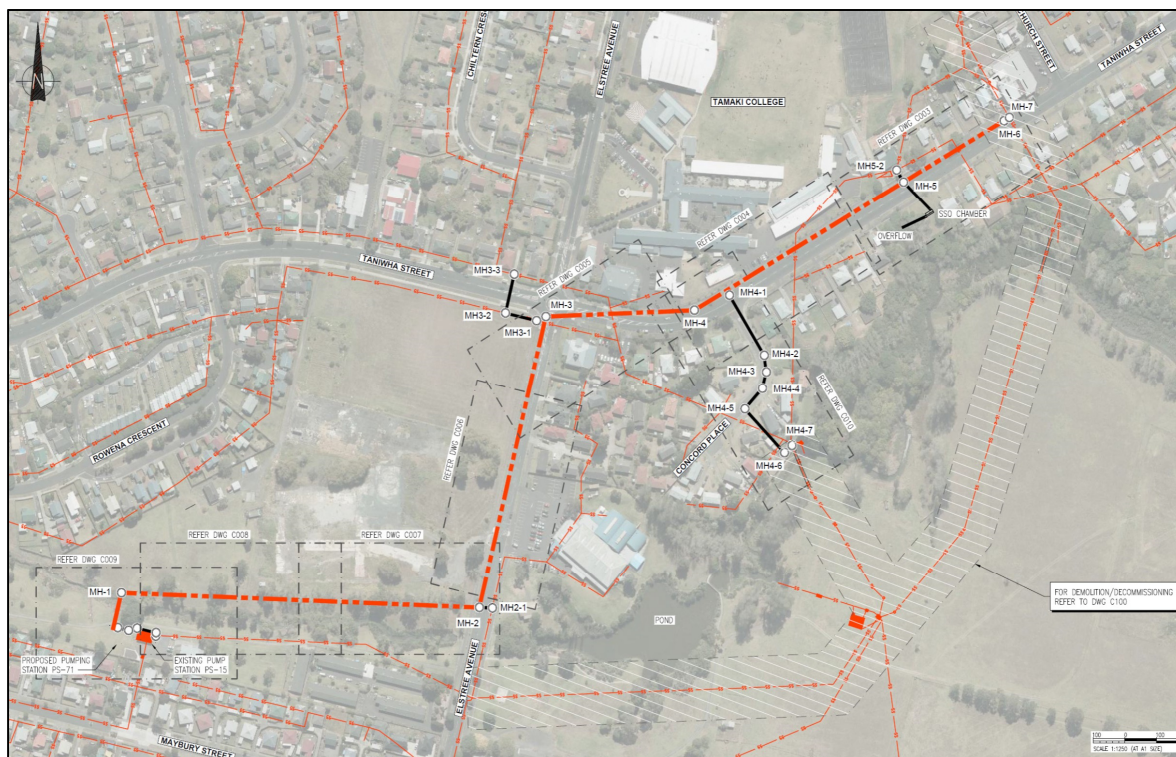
Glendowie Branch Sewer Upgrade – Overall Site Plan
